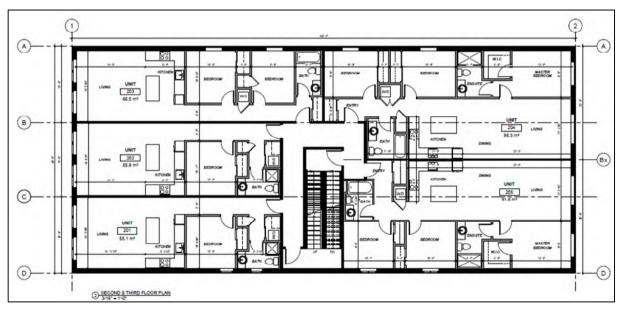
Preliminary Mixed-use Building Second Floor Plan (Jason Pizzicarola Design - Architects Inc.)
